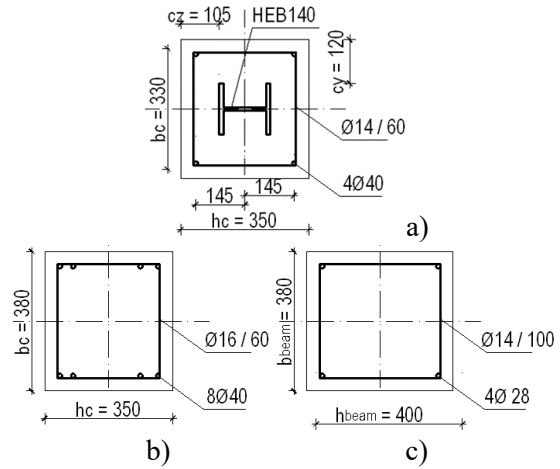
a) Composite column cross section; b) RC column; c) RC beam.
